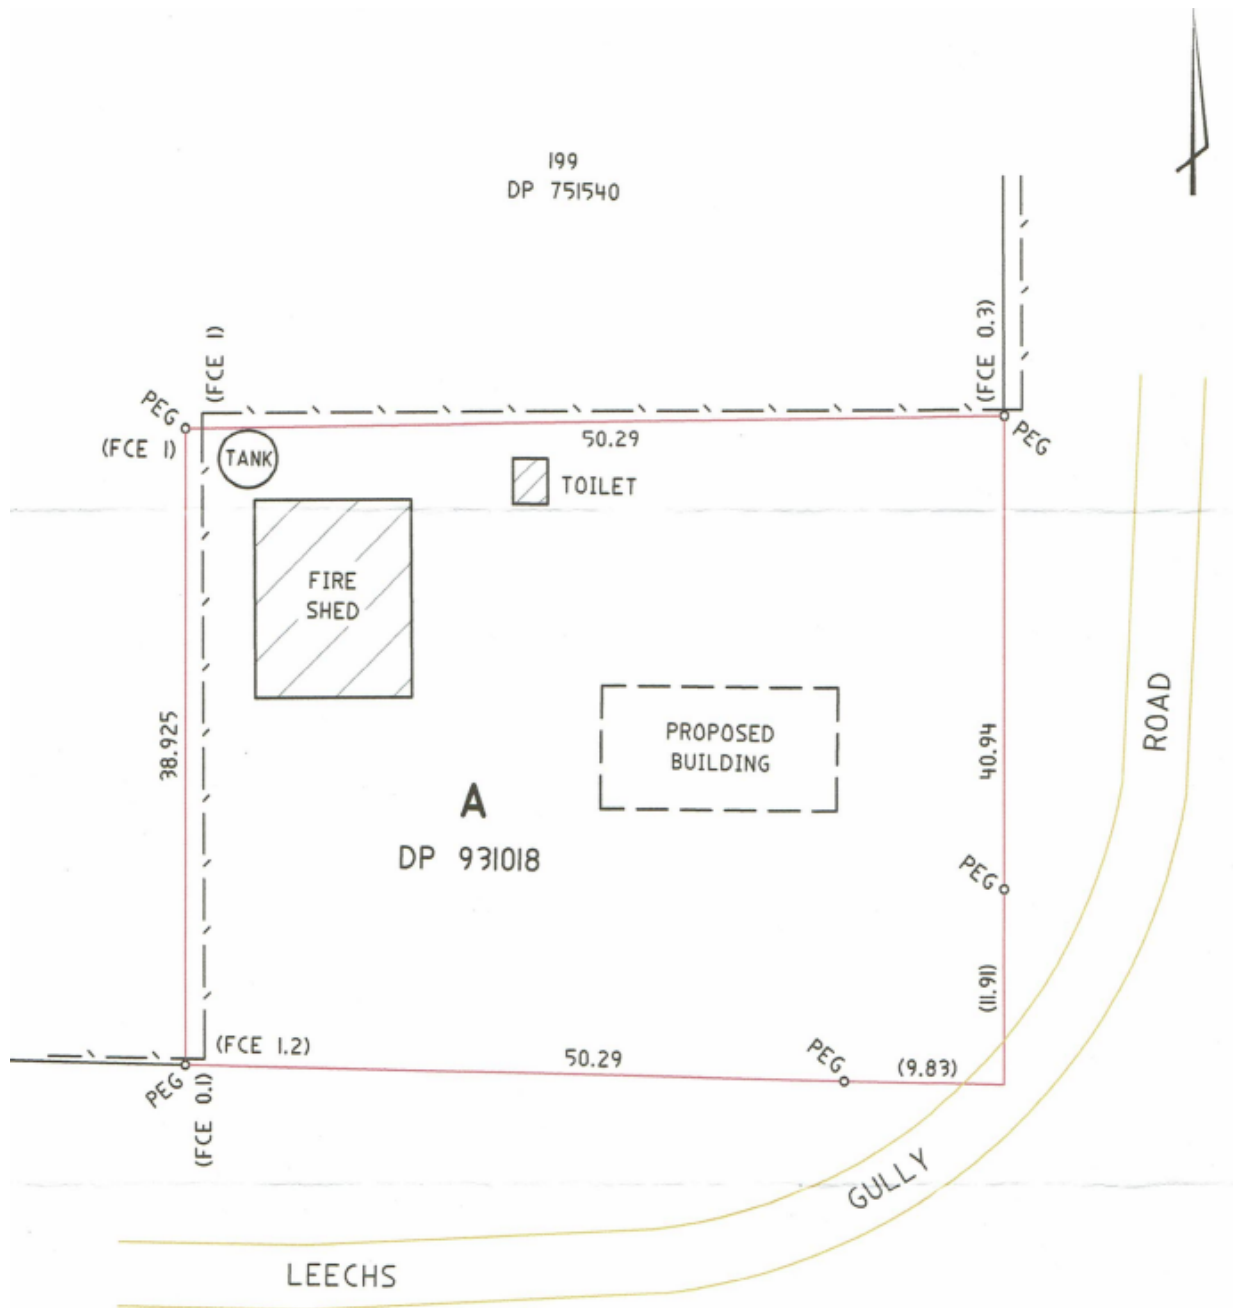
Plan of proposed re-location site on Leech's Gully Road, Leech's Gully.
